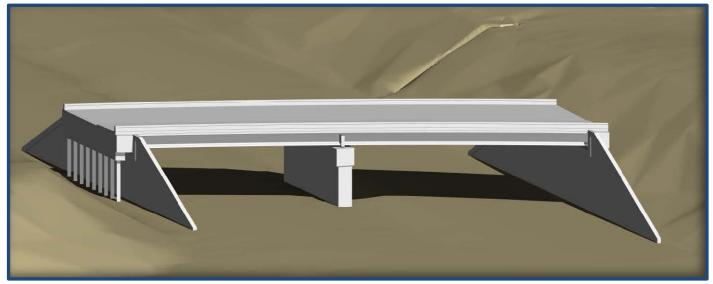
3D Model of Proposed Bridge Looking North Showing the MSE Abutment Face and Piles
